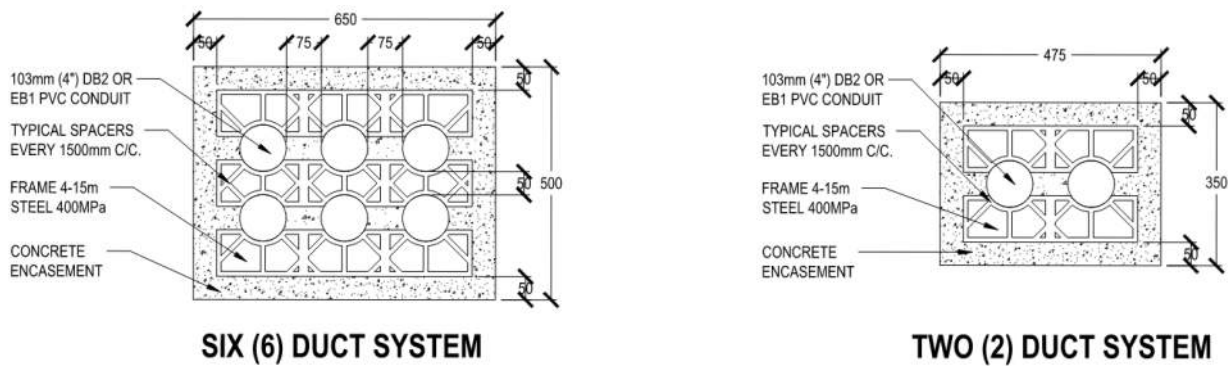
Typical Two (2) & Six (6) Concrete Encased Duct System Detail (Attain Drawing Page #9)
